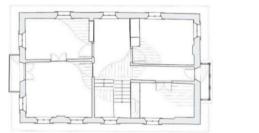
Drawing of the restitution of the first floor plan of the house with 137 blocks and 32 lots (drawn by Aynur Duysak Mankır, Mostar Architecture, 2018)
